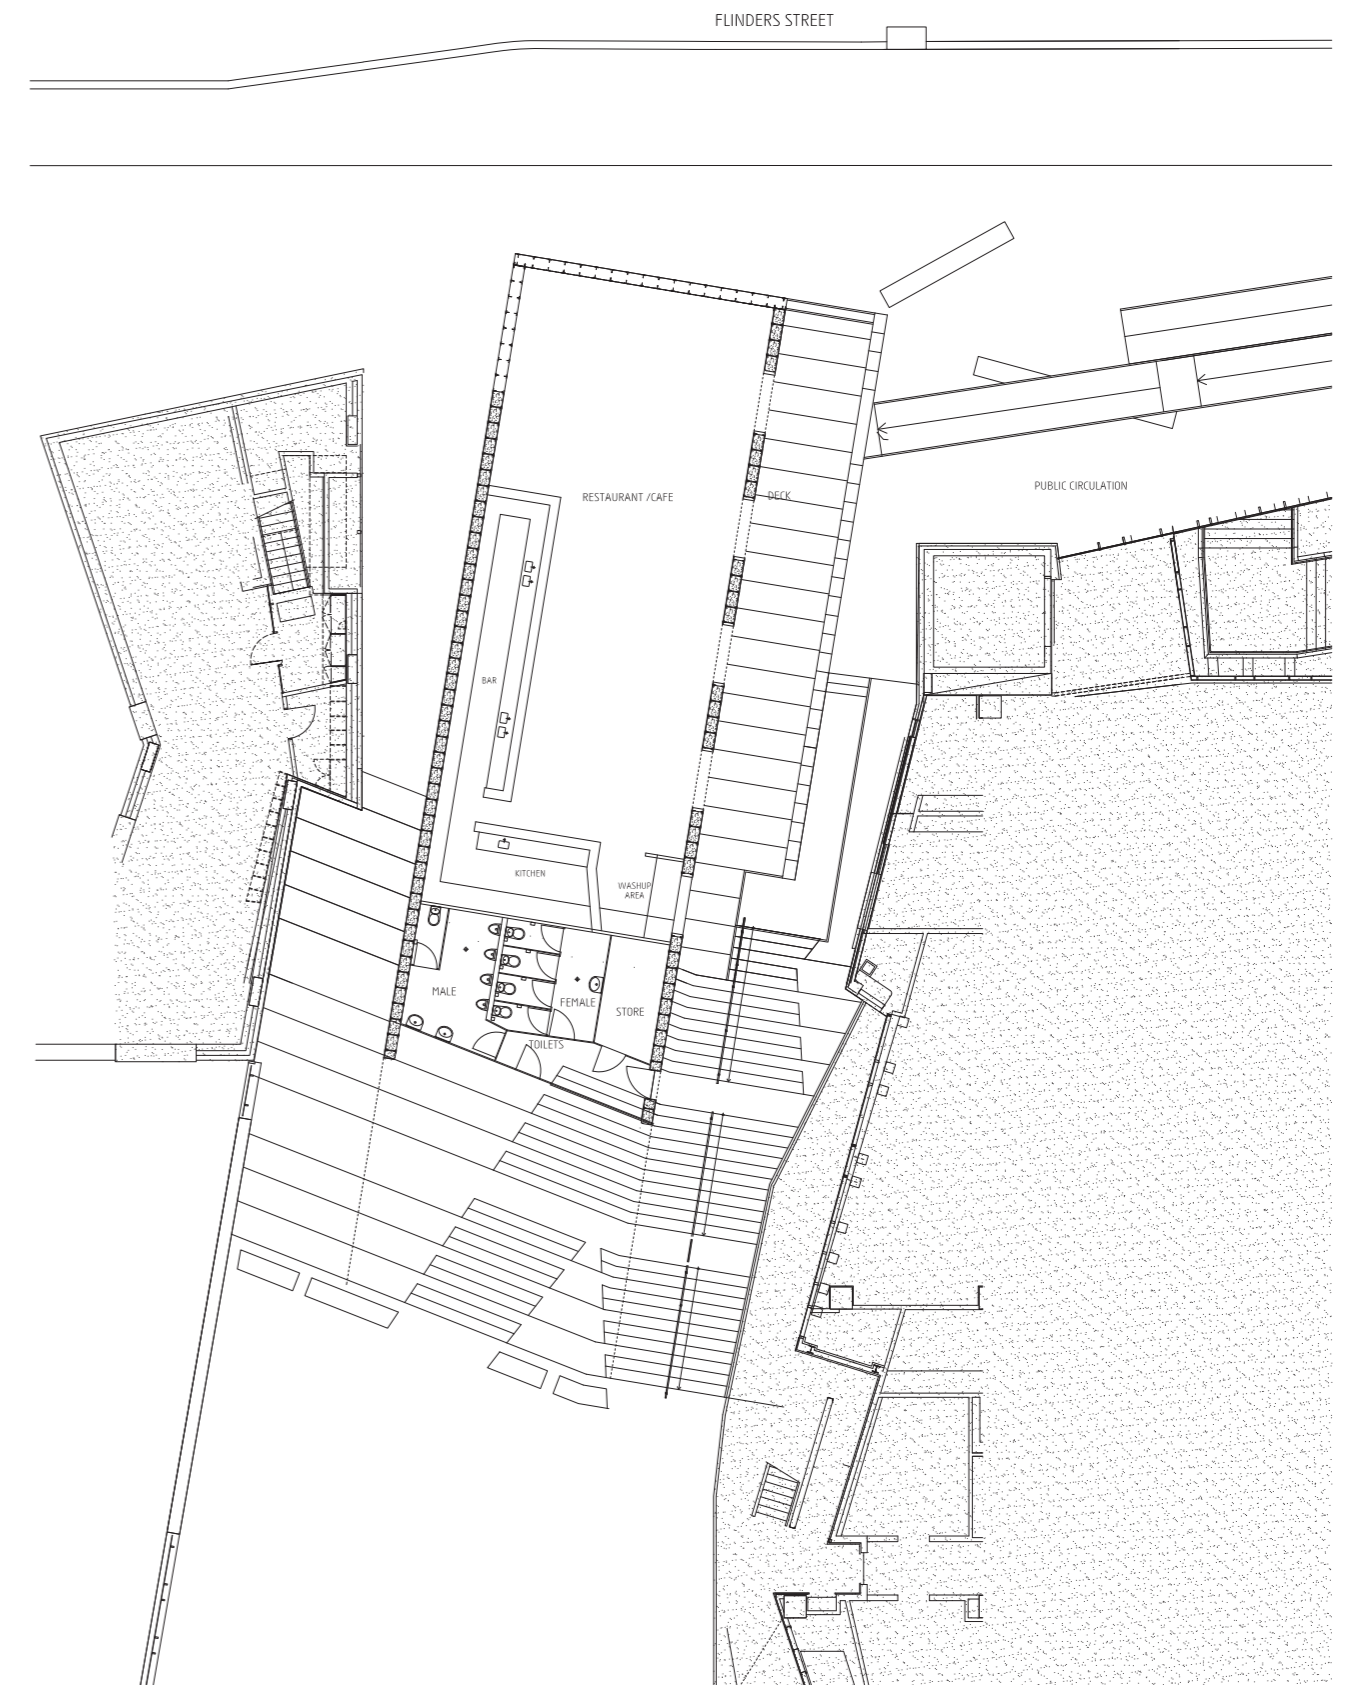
Greenhouse at Federation Square, Melbourne. Floor plan showing instertion into the plaza stair space between two buildings.
